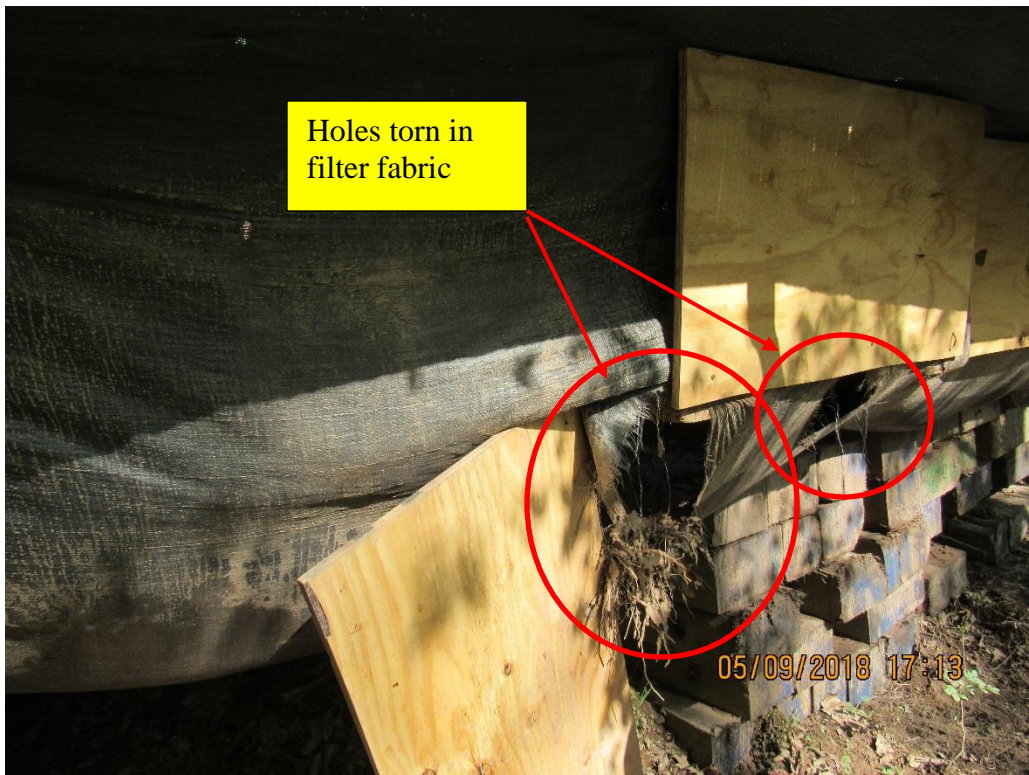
Tears in bridge filter fabric contributing to sediment laden water leaving site.
